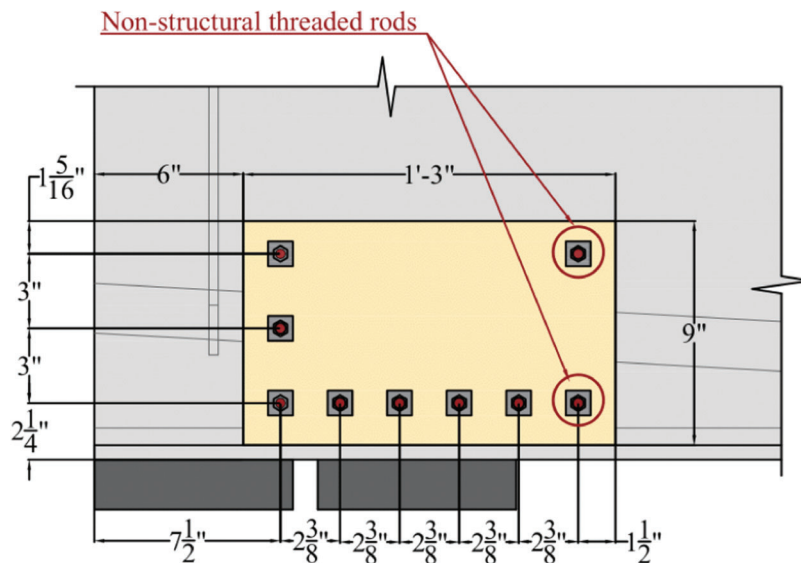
Case I: threaded rod layout with 7 effective threaded rods. Option 7: bottom.
